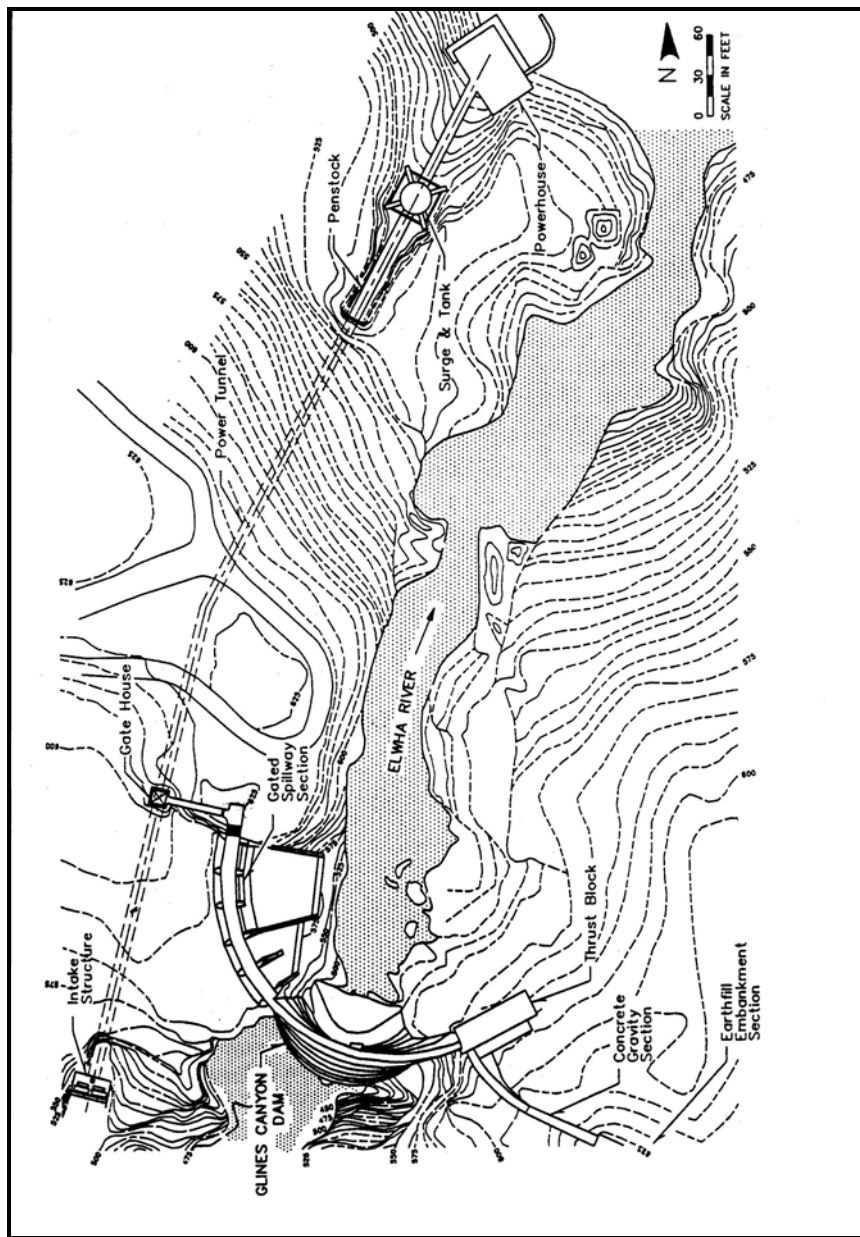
Site plan for Glines Canyon Dam and powerhouse (from FERC 1993).
